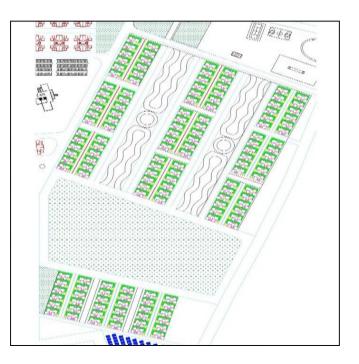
LAYOUT PLAN of BUNGALOW(MIG)
